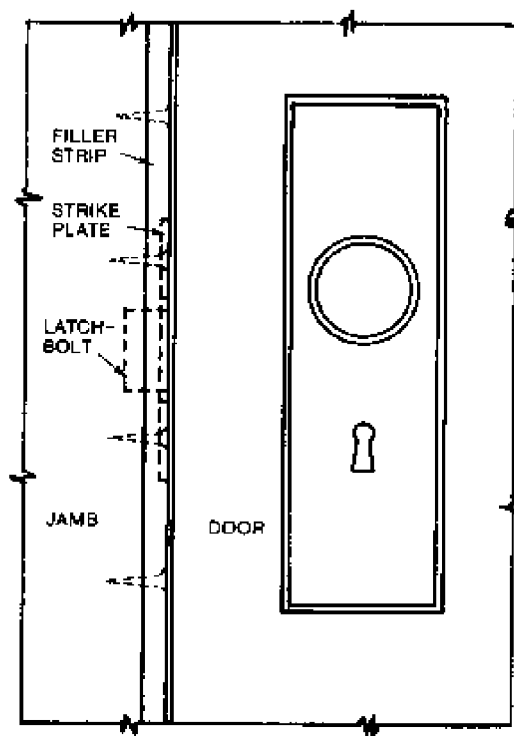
VIEW OF DOOR JAMB SHOWING FILLER STRIP.
